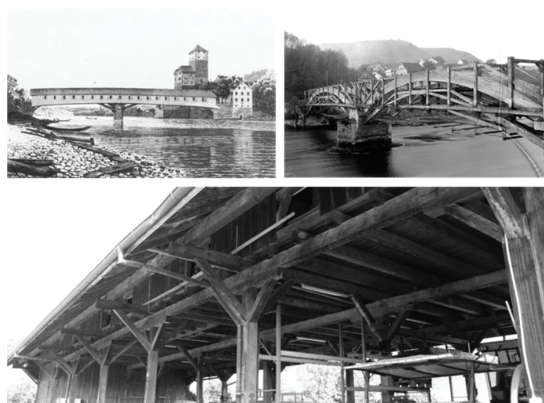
(Top left) timber bridge from 1810, (top right) deconstruction in 1919, (bottom) new barn built in 1920 and still in use
